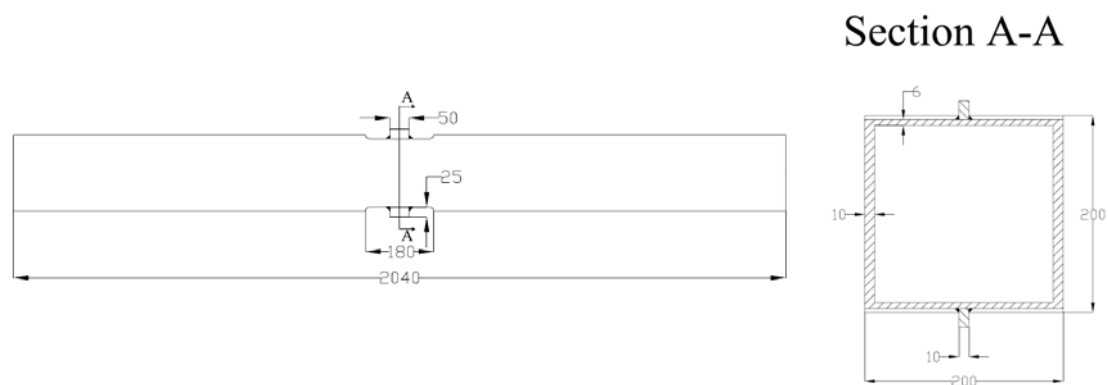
Test specimen geometry, dimensions in millimetres.
